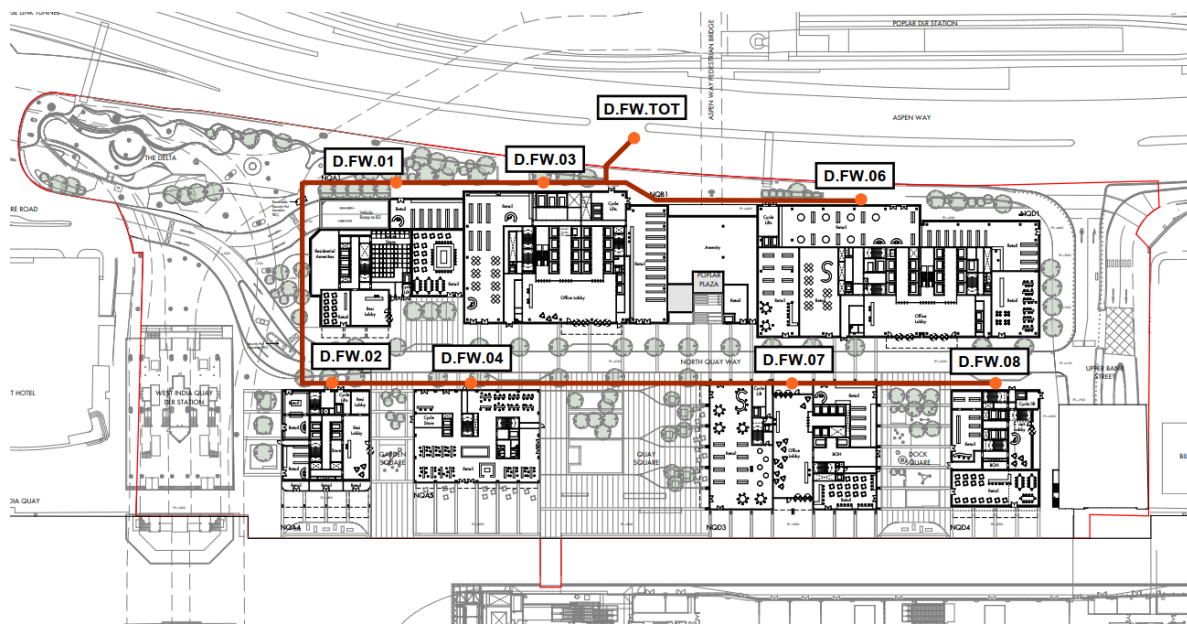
Site plan showing foul water connection points to each building and to the combined TW sewer in Aspen Way at existing manhole 6501.
